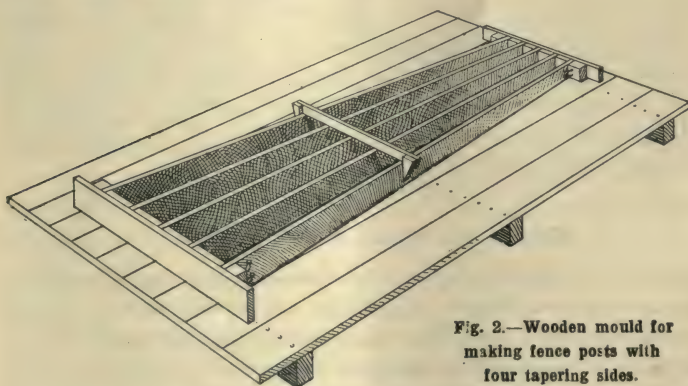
Wooden mould for making fence posts with four tapering sides.
